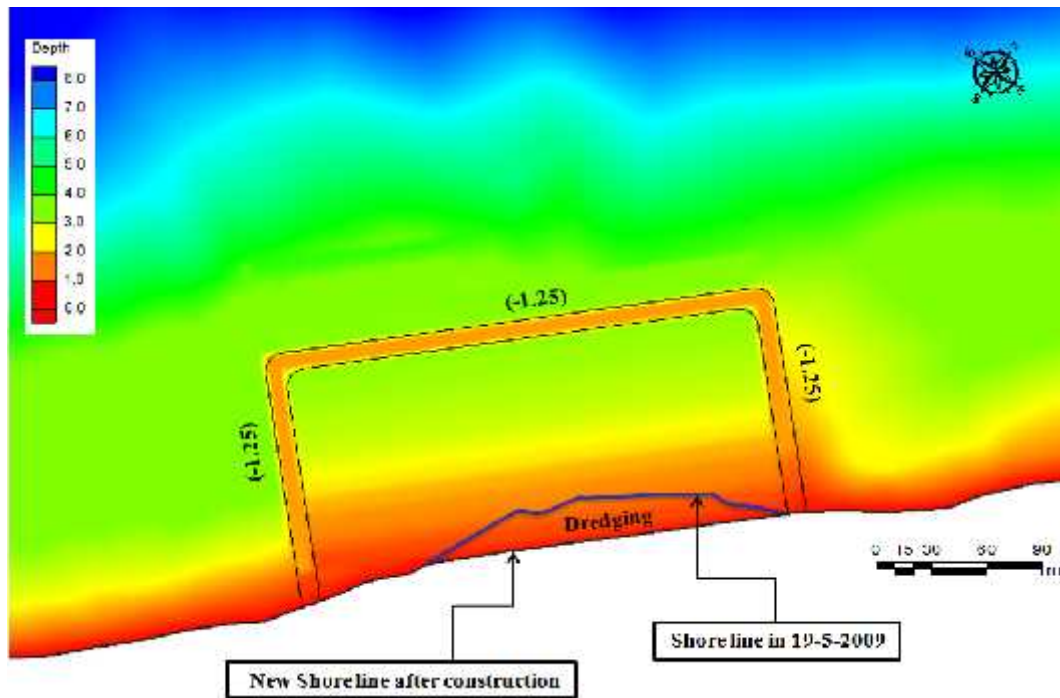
Layout of structures and sea bed levels for alternative (05)
